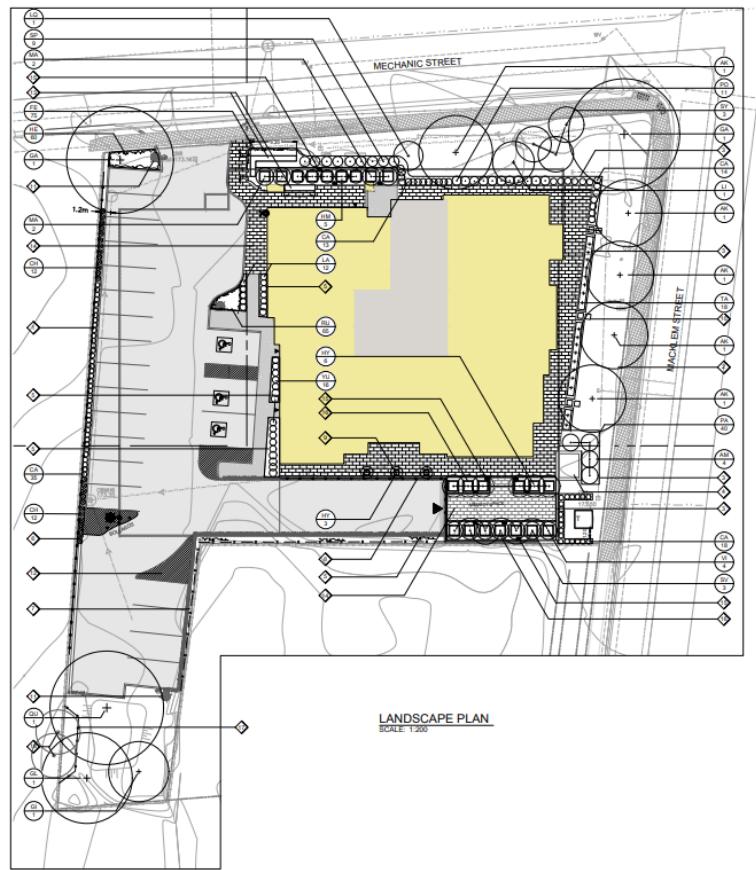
PROPOSED SITE PLAN – 5-STOREY APARTMENT BUILDING – 3665 MACKLEM STREET, NIAGARA FALLS, ON
